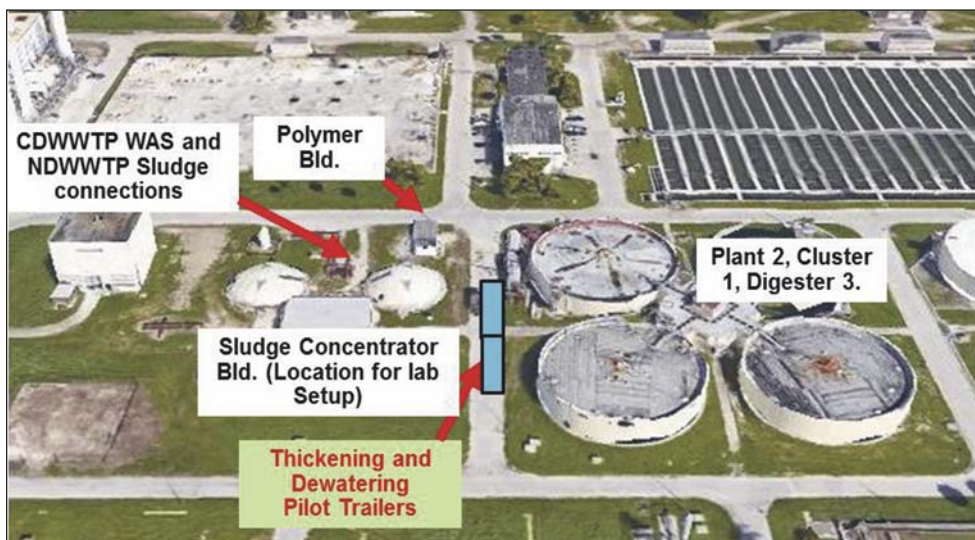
Site Plan Showing Centrifuge Pilot Installation at Central District Wastewater Treatment Plant on Virginia Key
